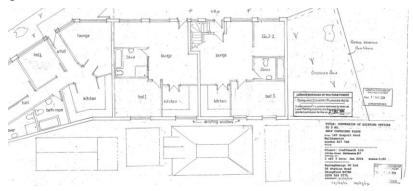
Ground Floor Floorplan of 145 Gosport Road
